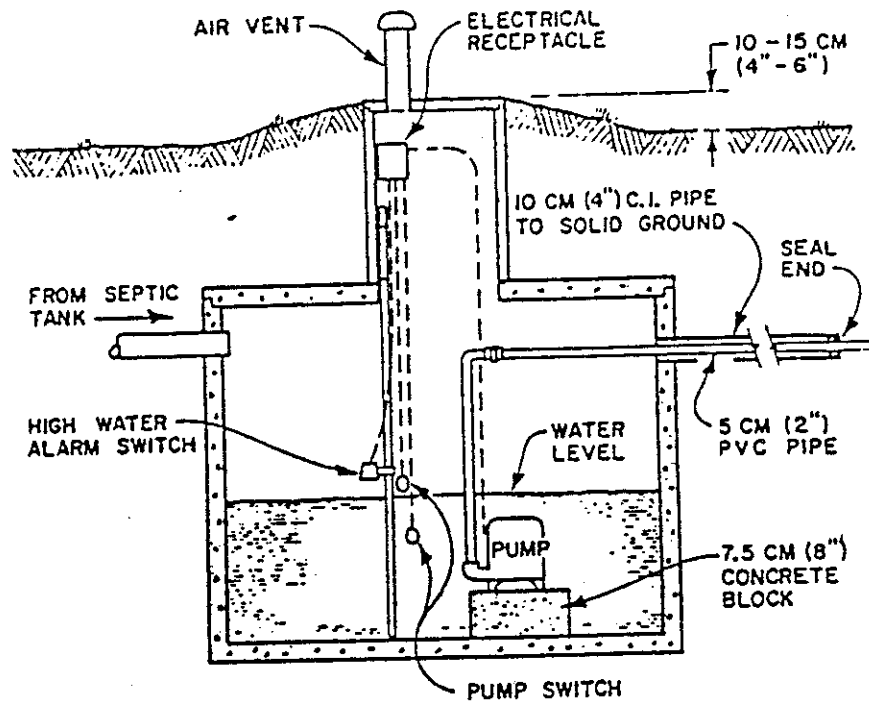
A Detailed Cross-Section View of Pumping Chamber.
